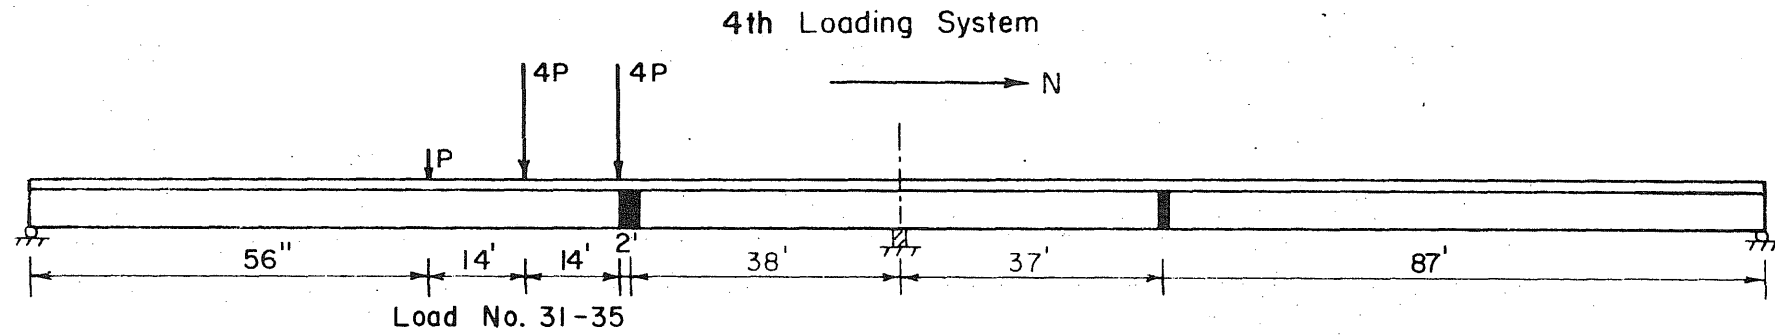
LOCATIONS OF LOADS FOR MAXIMUM SPLICE SHEAR, SOUTH SPAN SERVICE LOAD TEST
